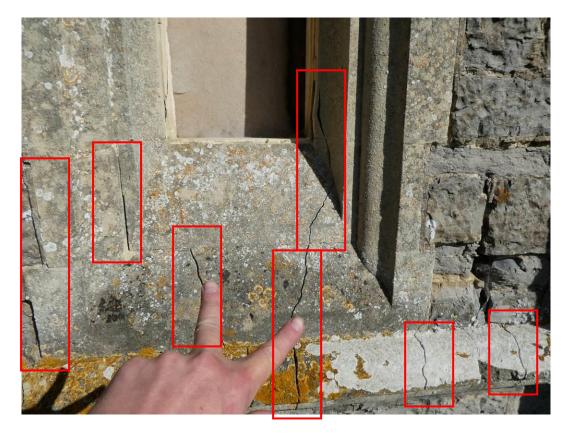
P1000368 Masonry Fractures & Open Joints in 3rd Stage Window Sill South Elevation
